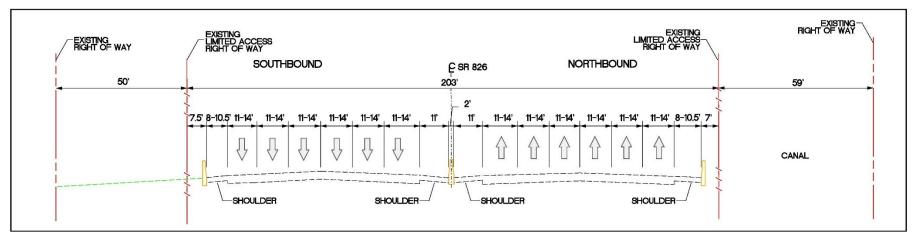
2: Existing Roadway Typical Section between SR 874 and SR 836
